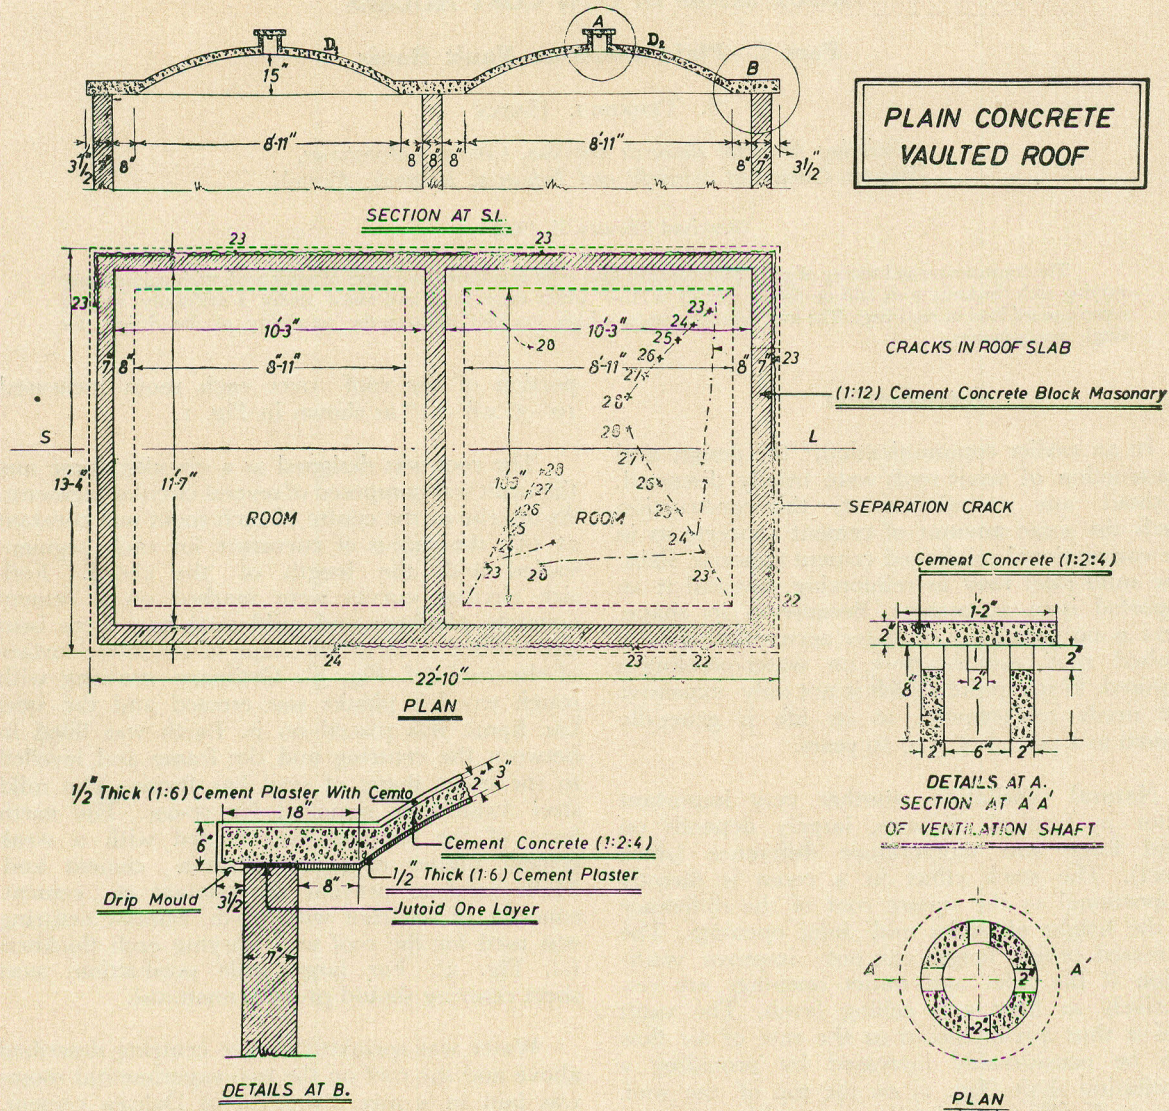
The construction and testing details of the experimental rooms with vault roof of uniform arch thickness. Test load: 210 lbs./sq. ft. on the curved surface of the roof.
